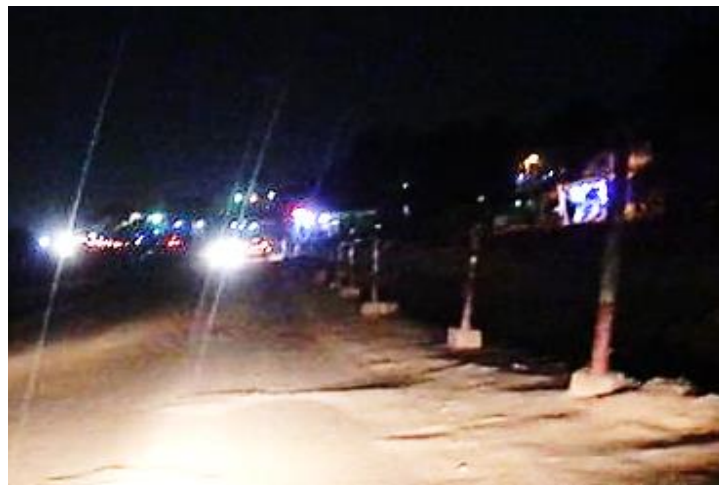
Poor barricade and sub-standard stop/“road closed” sign
